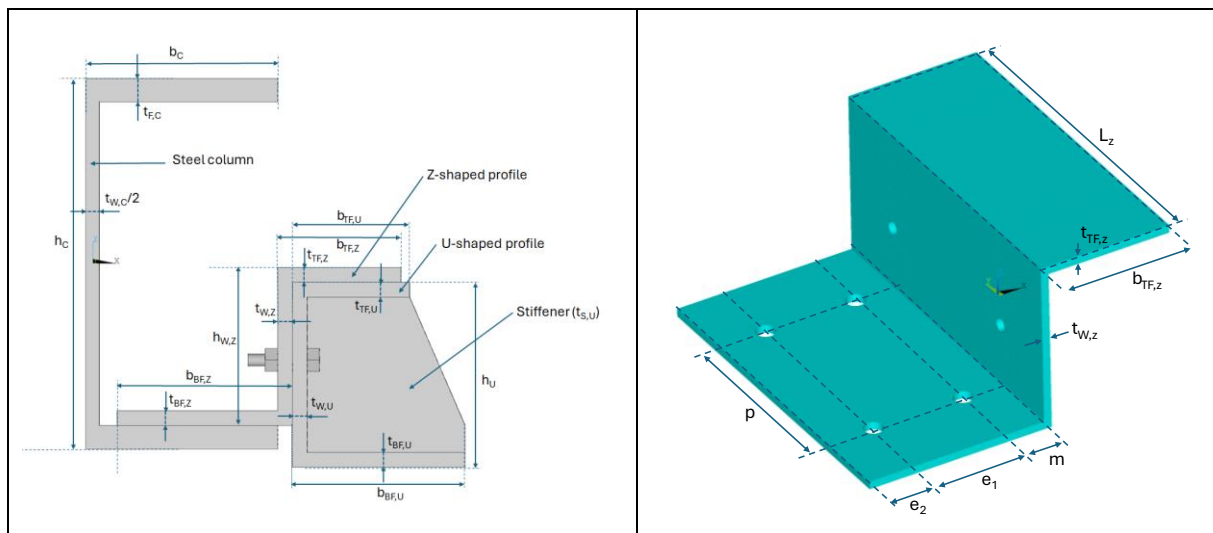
Definition of geometrical dimensions for the fusible link n°2
